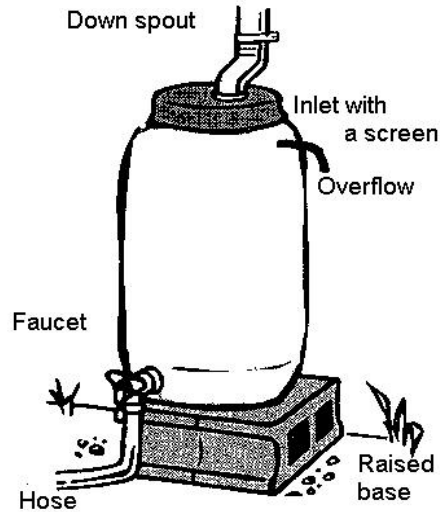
Typical rain barrel setup, to collect stormwater runoff from a rooftop [source: <http://www.ci.berkeley.ca.us>]
